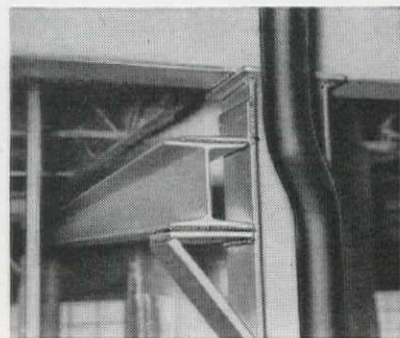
Typical Beam-to-Column Connection designed for second floor loading of 200 pounds per square foot. Columns are 8" x 8" and beams 12" x 12" H beams. Also shows bracket for crane rail.
